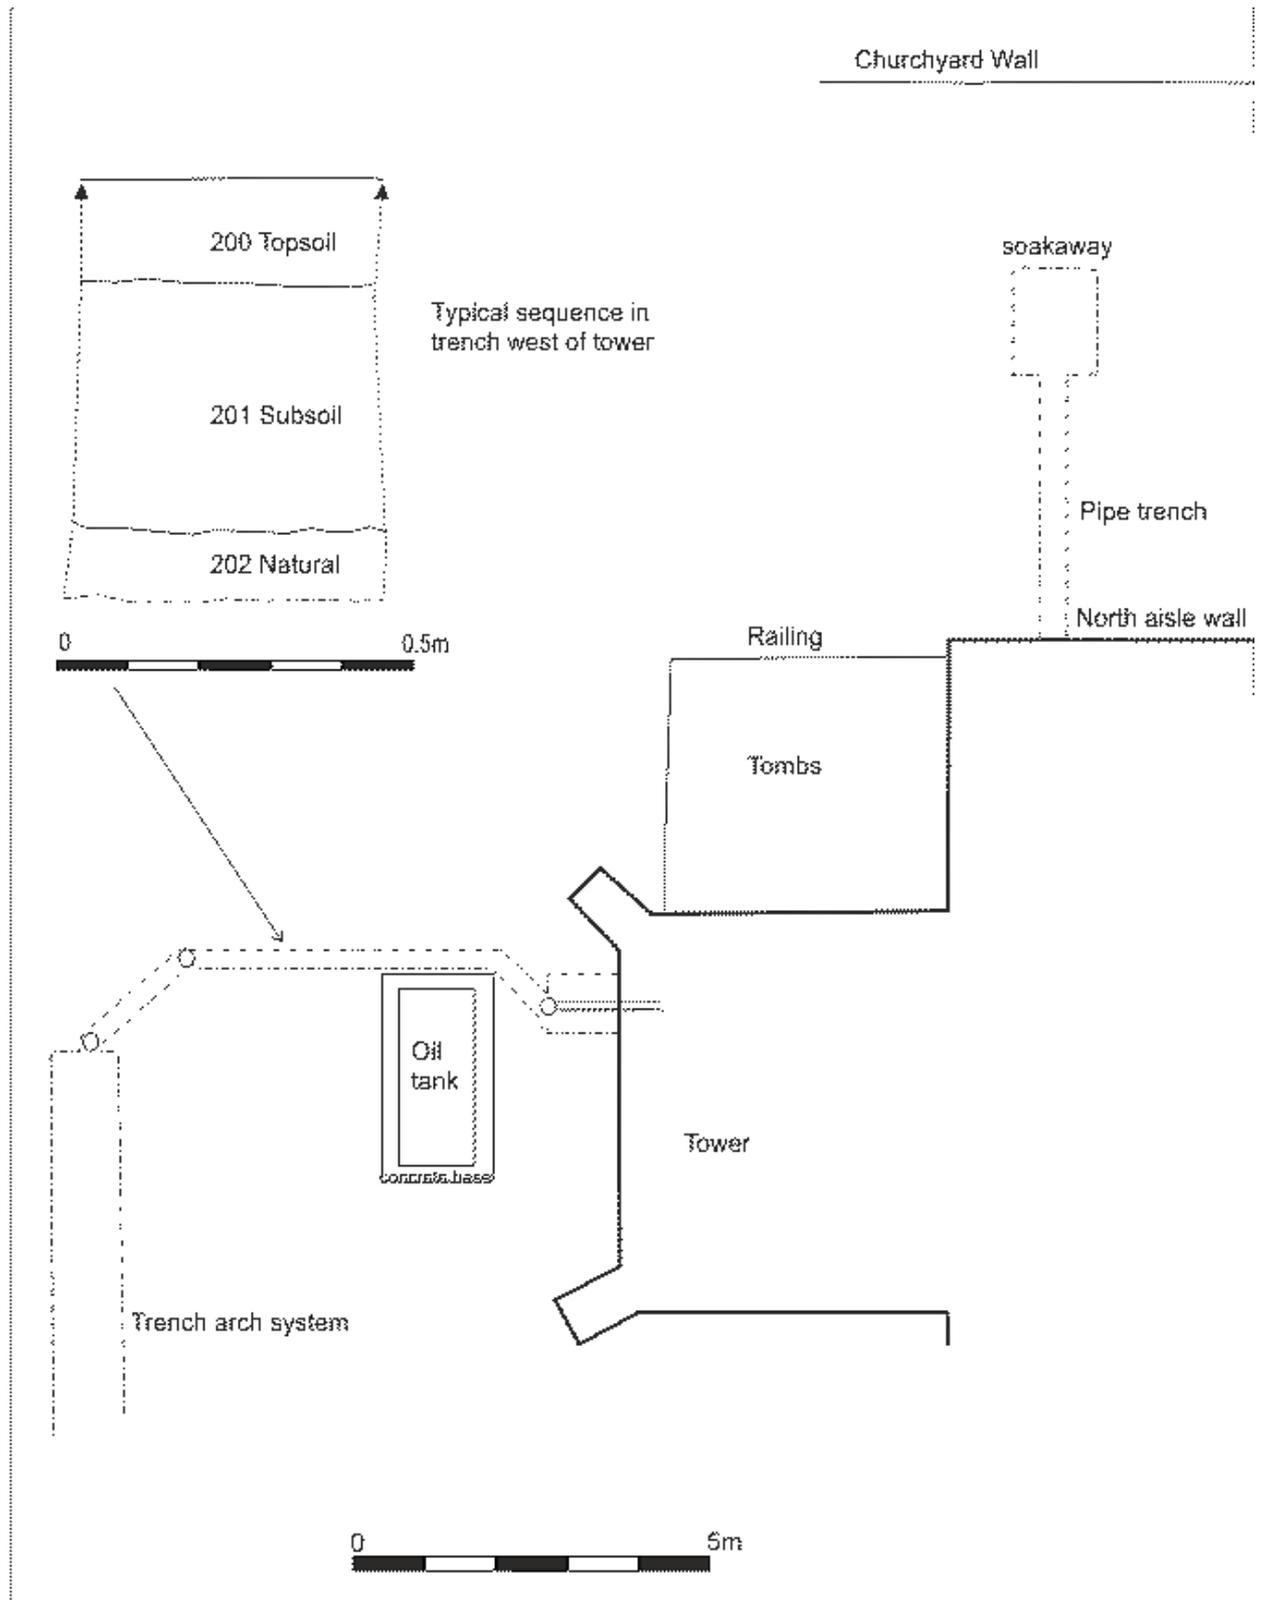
Plan of excavations for trench arch system and surface water drainage
